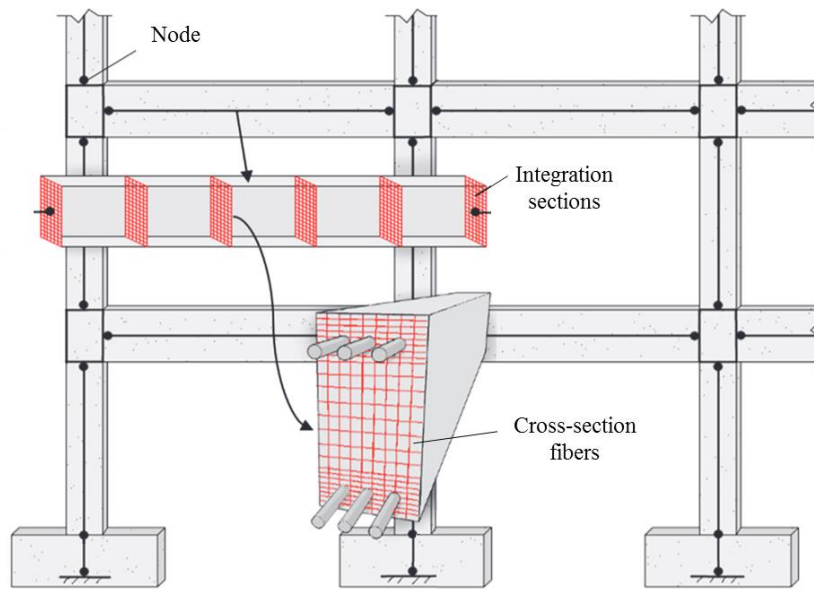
Fiber-element modeling of a reinforced concrete frame (after ATC, 2016)
